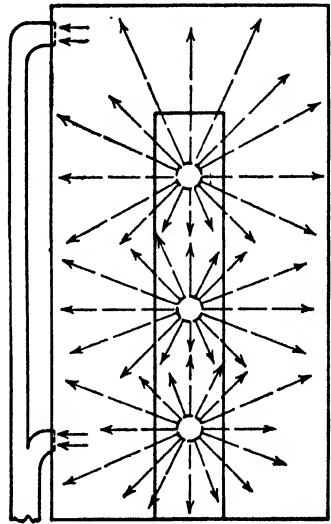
Plan and cross section. Room equipped with three ceiling outlets or plaques.
